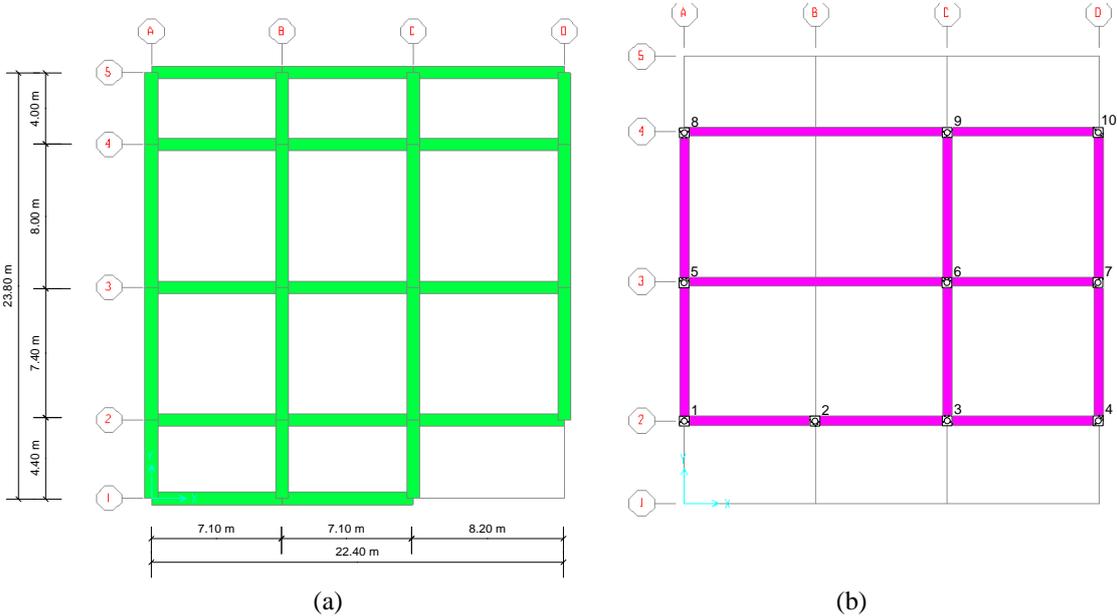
Plan view of (a) the building floors and (b) the Isolation Interface with the Grid of the tie-Beams of the Basement Columns.
